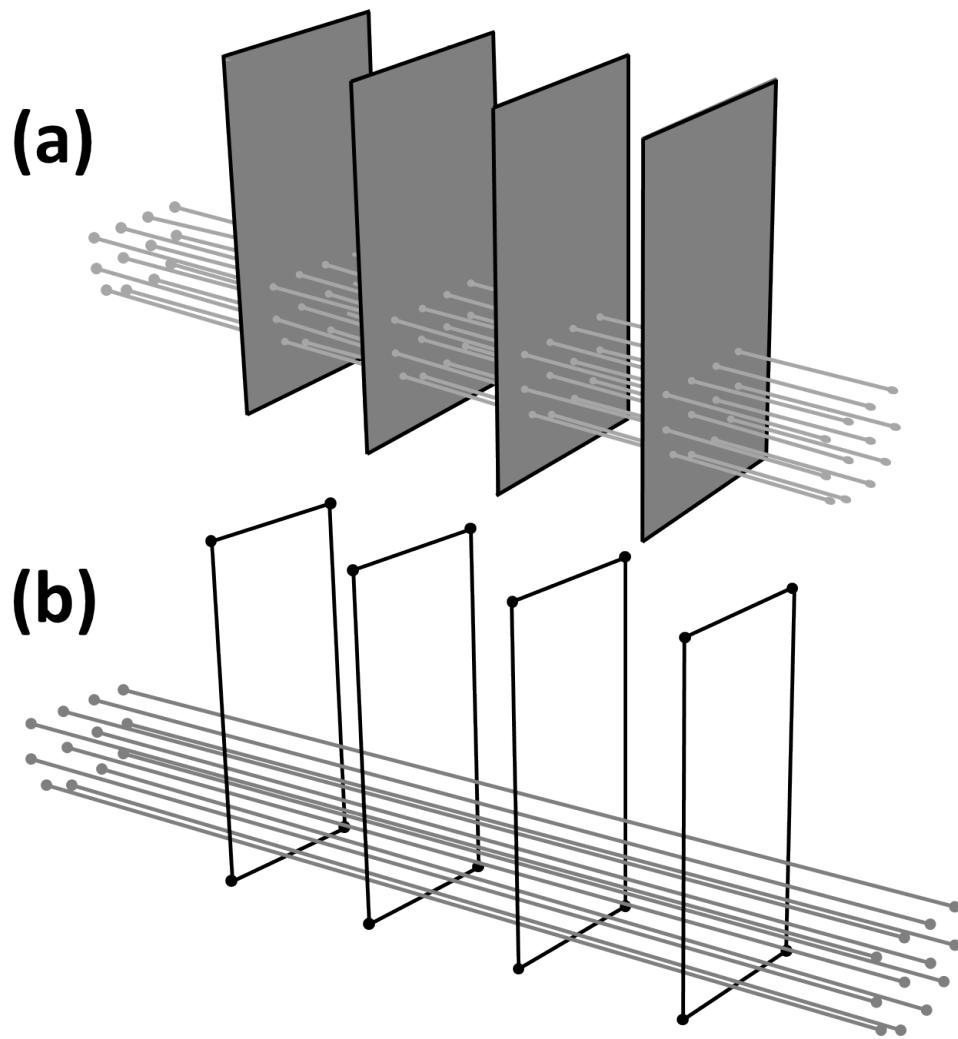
Modelling of Transverse Reinforcement: (a) Membrane Sections (b) Truss Sections
